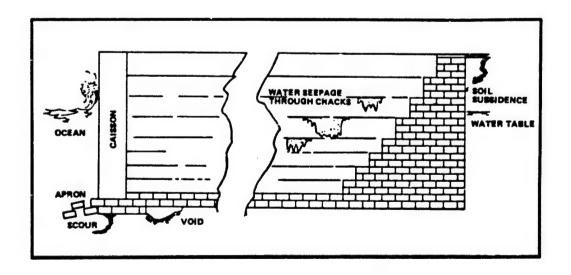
Failure and Damage in Stone Masonry Structures.
